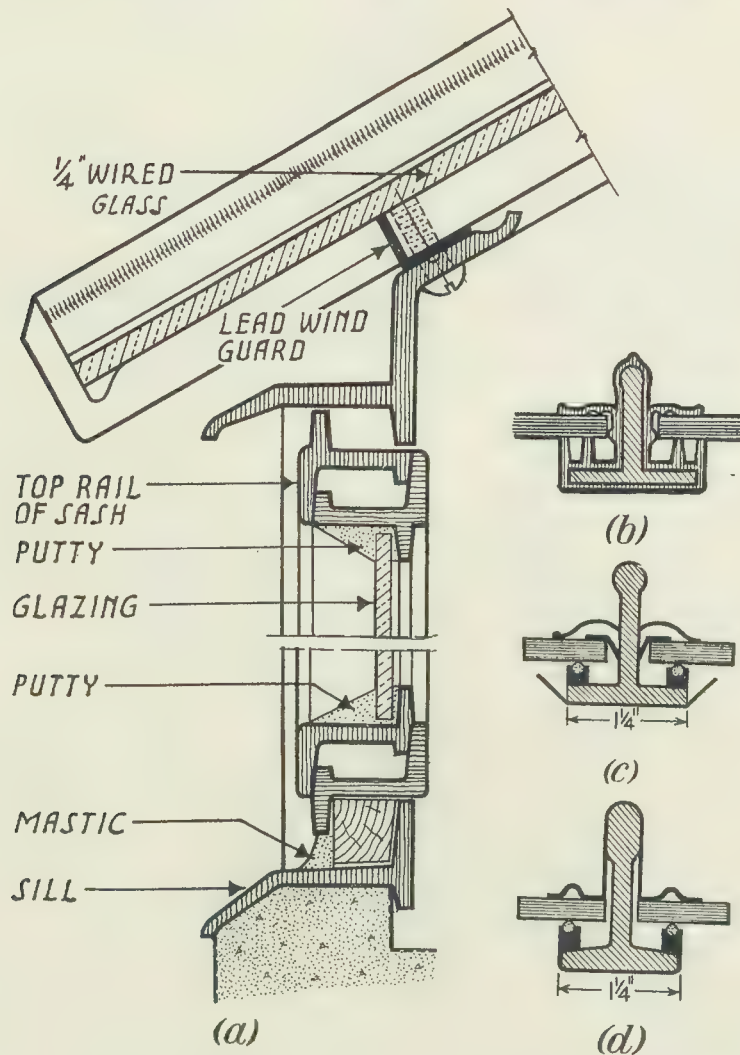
DETAILS OF METAL SASH AND GLAZING BARS
